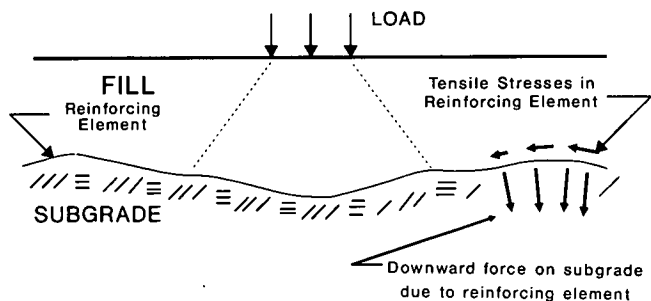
Effect of reinforcement on behavior of a subgrade-haul road section with reinforcement.
